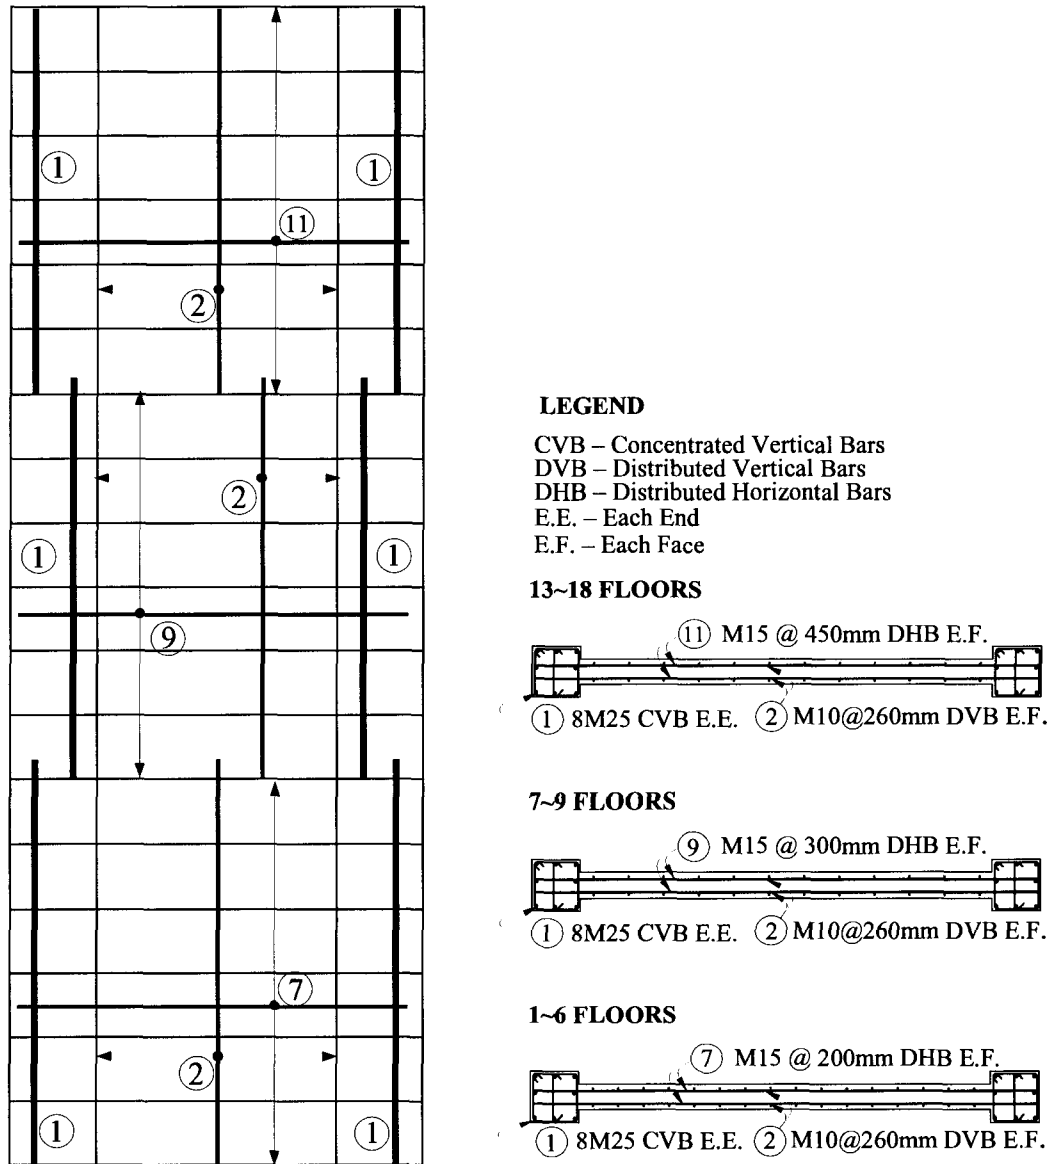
Shear wall reinforcement in B18 building located in Montréal.
